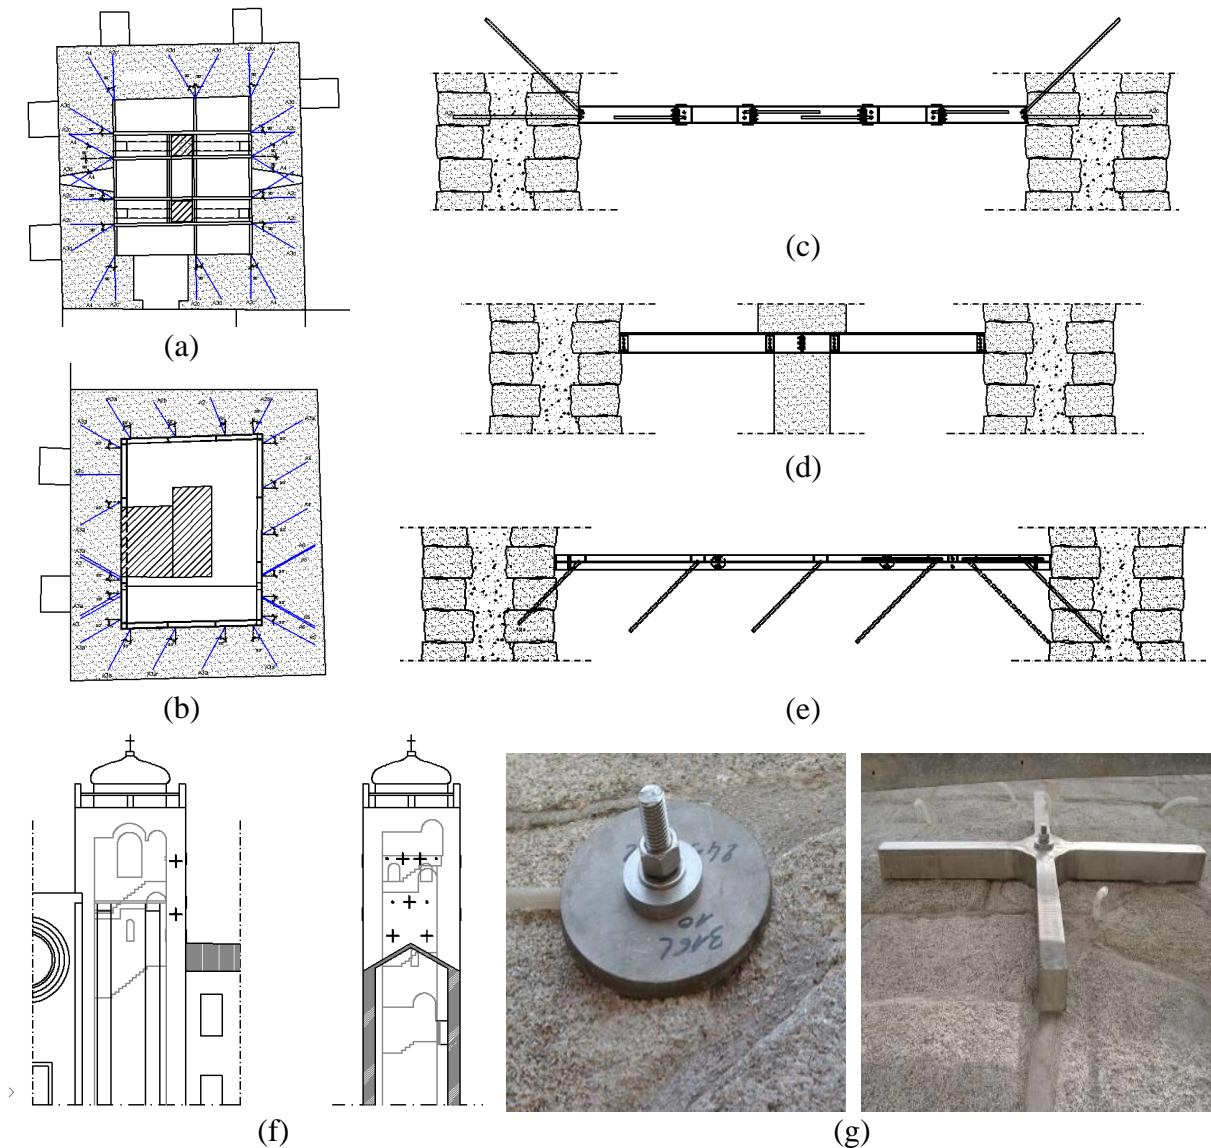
Aspect of the strengthening of the towers: (a) Ring for the north tower; (b) Ring for the south tower; (c) North-south section for north tower; (d) West-east section for north tower; (e) Typical section for south tower; (f) Additional ties in the west and south façades of the south tower; (g) Details of the anchorage plates.
